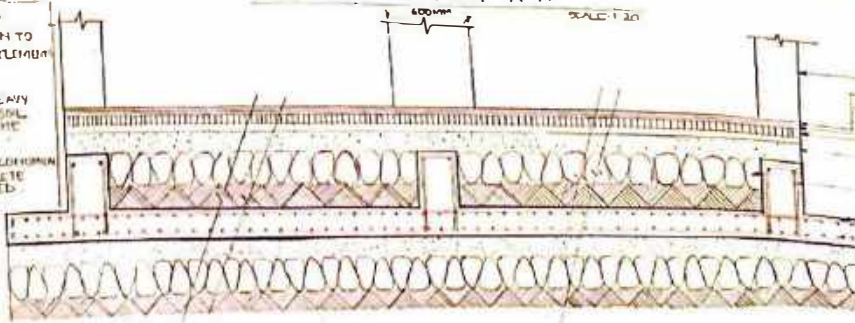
DETAILED PLAN OF COLUMN-BEAM-SLAB JUNCTION
